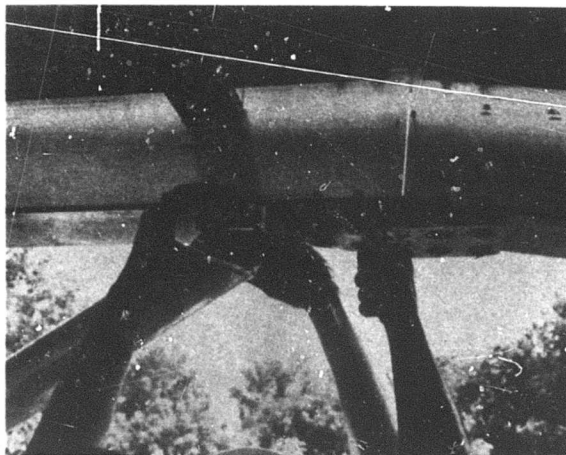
Locating "V" Truss Clamp on Main Arch Beam
